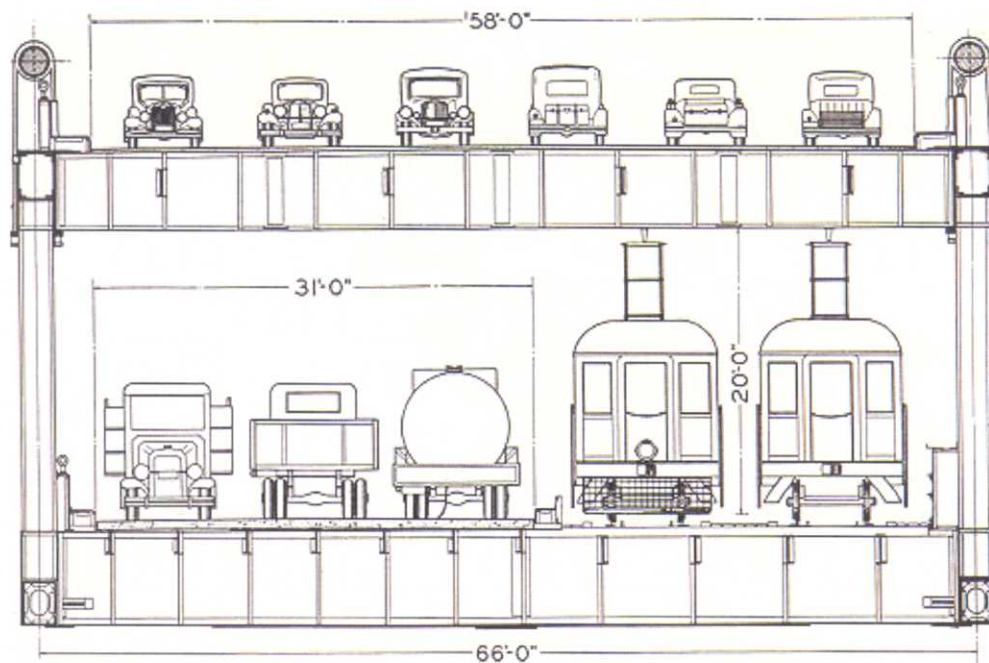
The bridge will have two decks. The top deck will have six lanes for passenger automobiles; the lower deck will have three lanes for trucks and buses—it will also have two standard gauge electric railway tracks.
